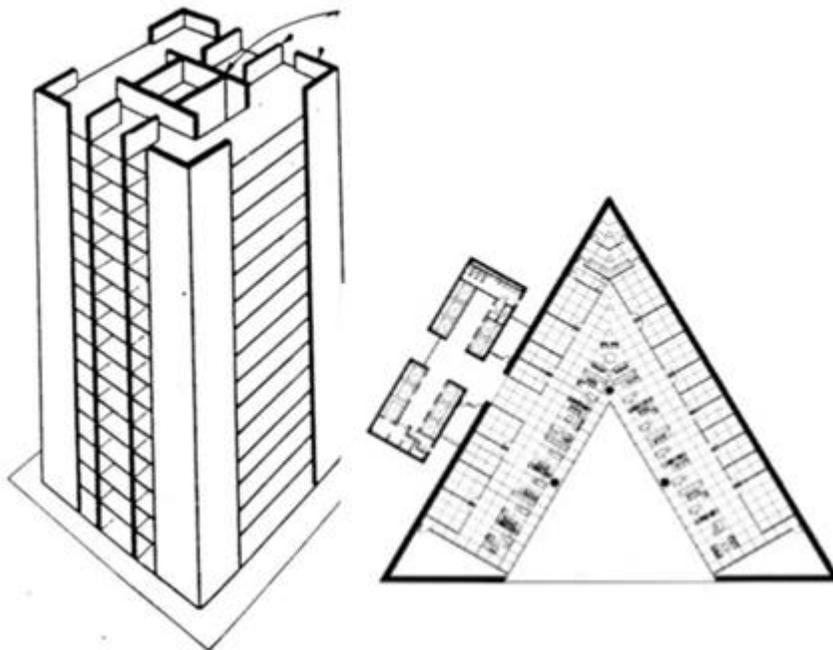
Axonometric View of Shear Walls System, Example (left) and Characteristic Floor Plan of the National Commercial Bank, Showing the Symmetry in Arrangement of Shear Walls (right) [180]
